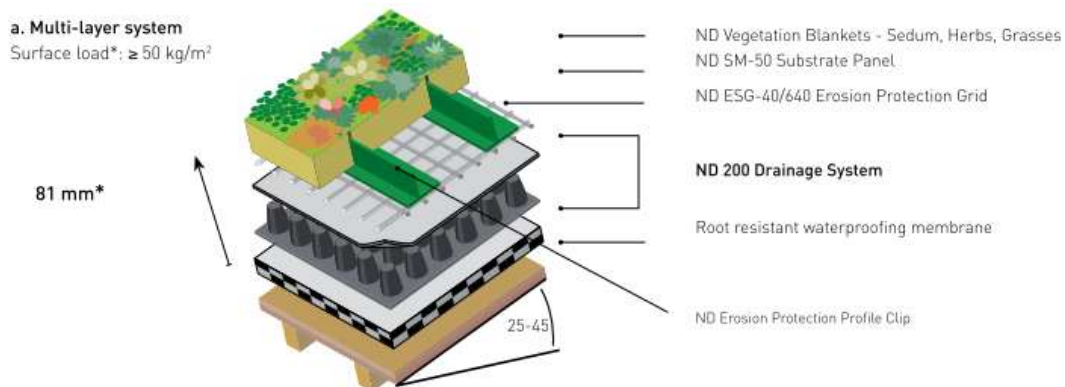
Example of steep-slope green roof (Source: Nophdrain, 2010)
